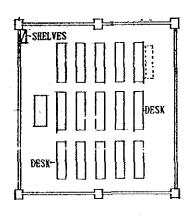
PLAN OF CLASSROOM FOR 30 TRAINEES
